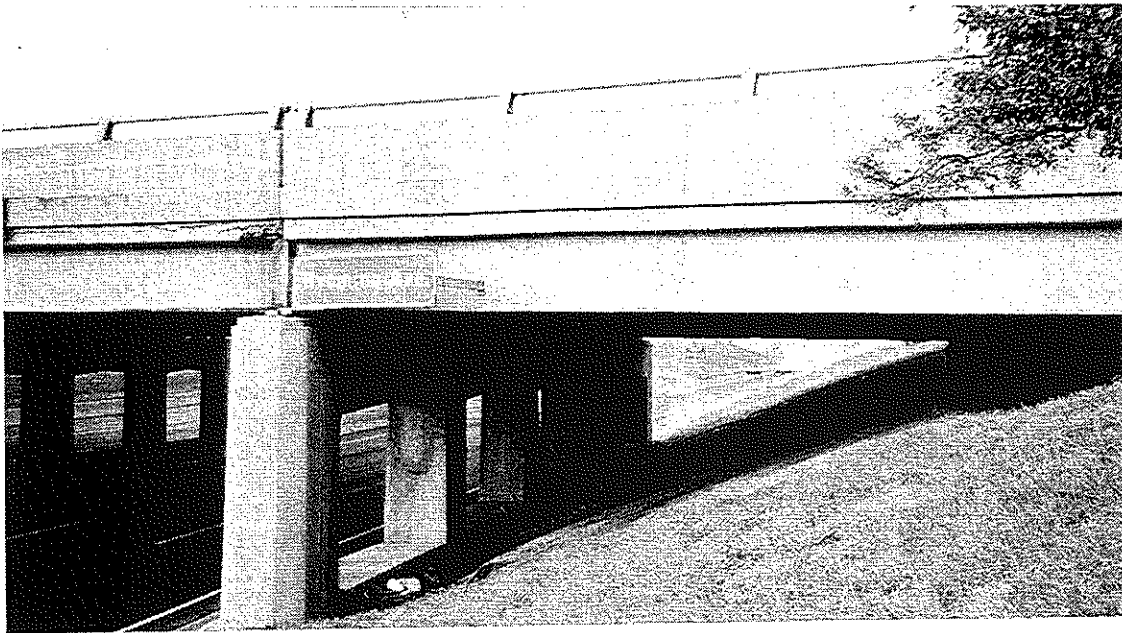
Bridge WY/I94 on Wyoming Road over I-94 in Detroit.
